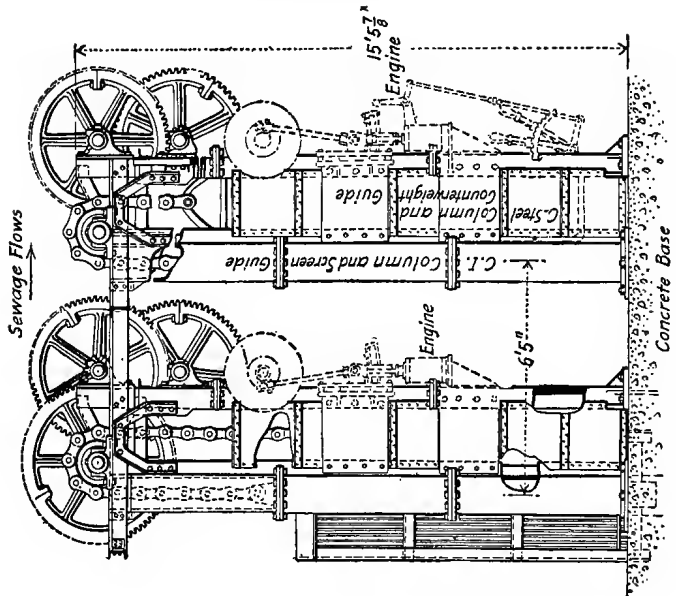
Sectional elevation of Ward Street rack chamber.
